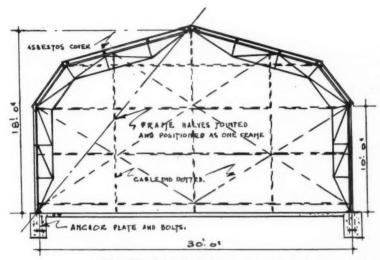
Light tubular construction incorporating composite roof truss and tubular columns.
